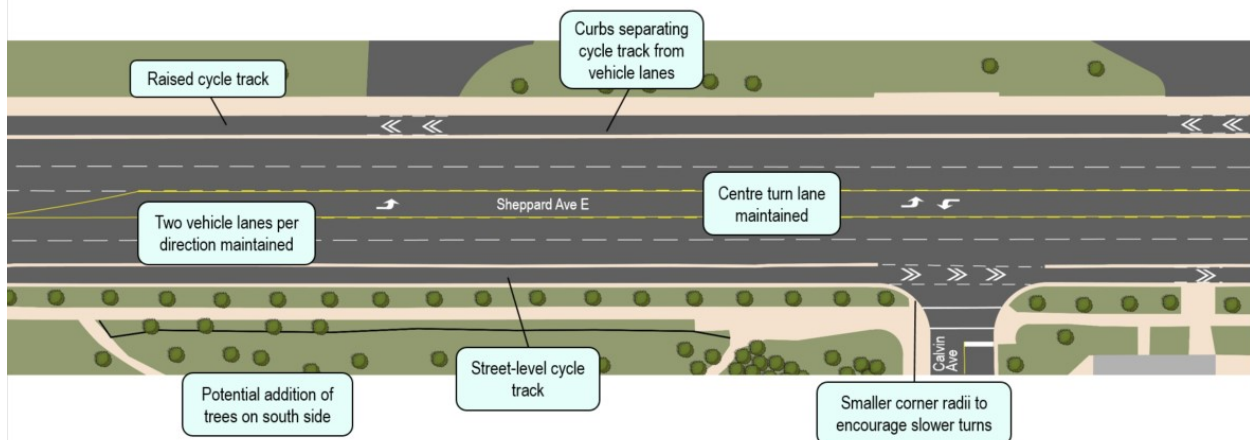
A plan view of the proposed Sheppard Avenue East design east of Wilfred Avenue.
